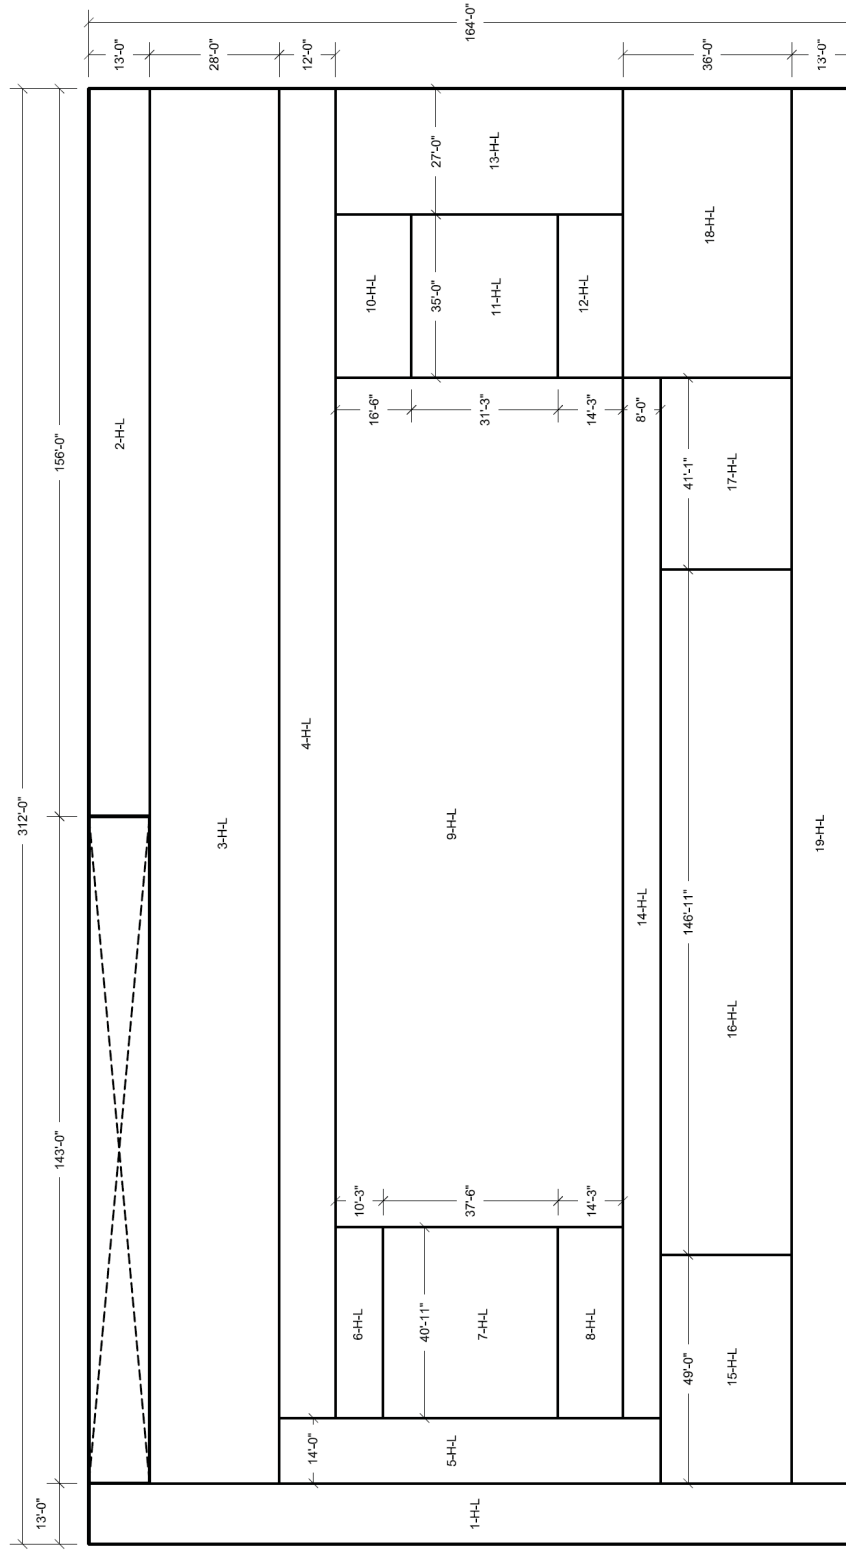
H.6-131: UHS BASIN FOUNDATION MAT
